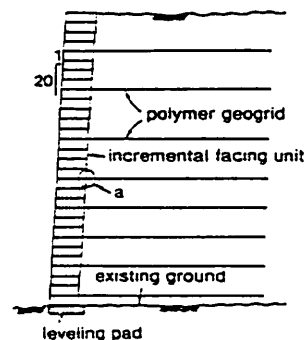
Concrete blocks facing (Simac et al., 1990).
